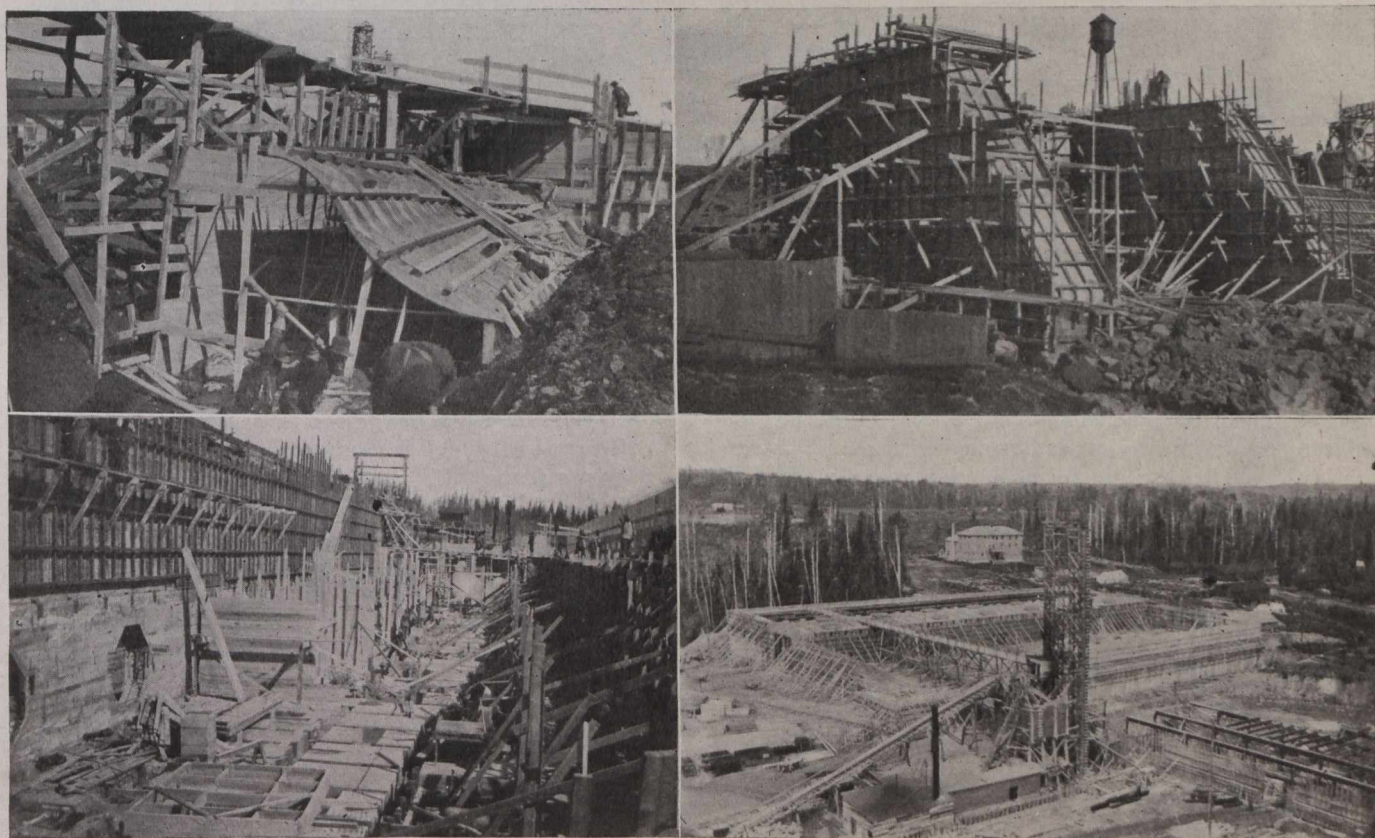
Formwork Typical of Dam, Power House and Mill Construction.
